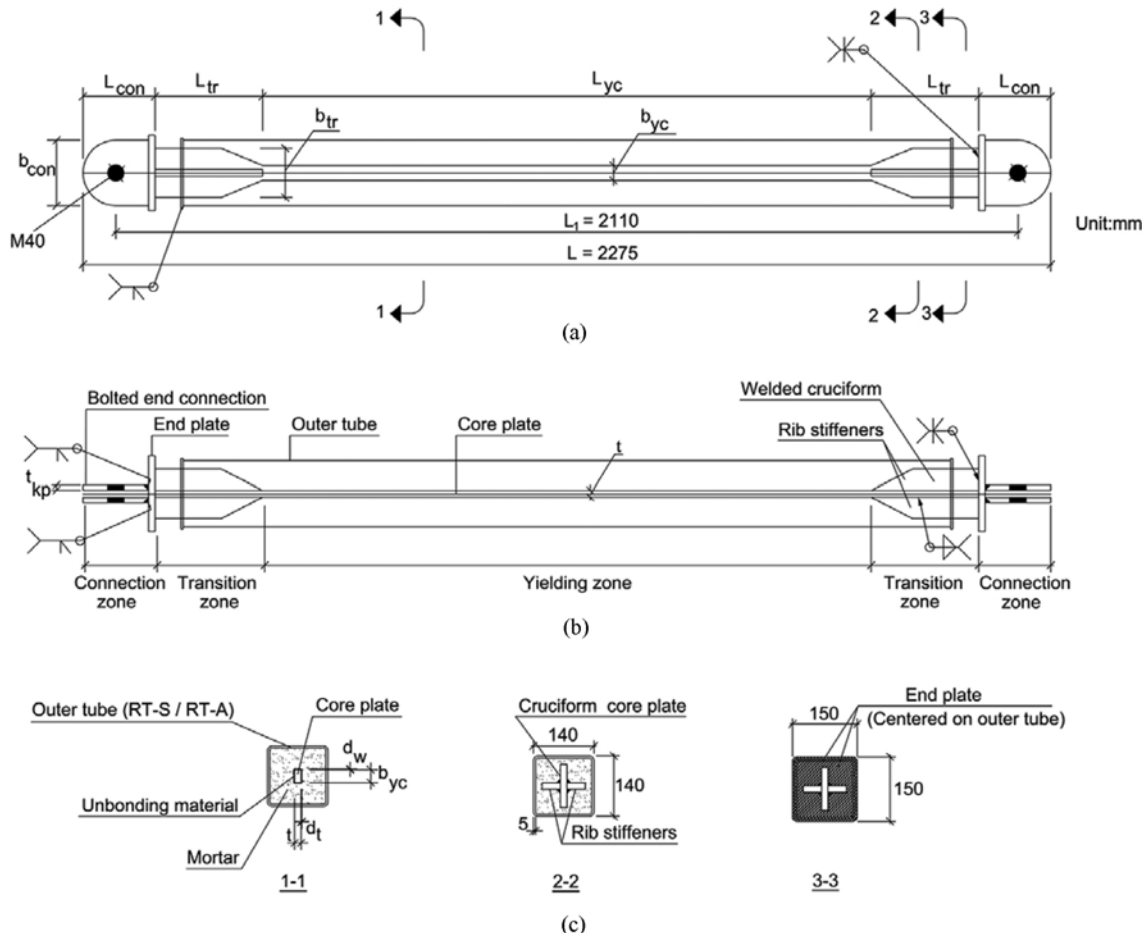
BRB Configurations for Single Bolted End Connection BRBs (BRB-SC4 and BRB-SC5): (a) Front View, (b) Top View, (c) Cross-sections
